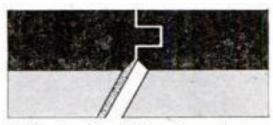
Insulation boards, as well as tiles and planks, are manufactured with interlocking joints of various kinds. Some typical ones are shown above
